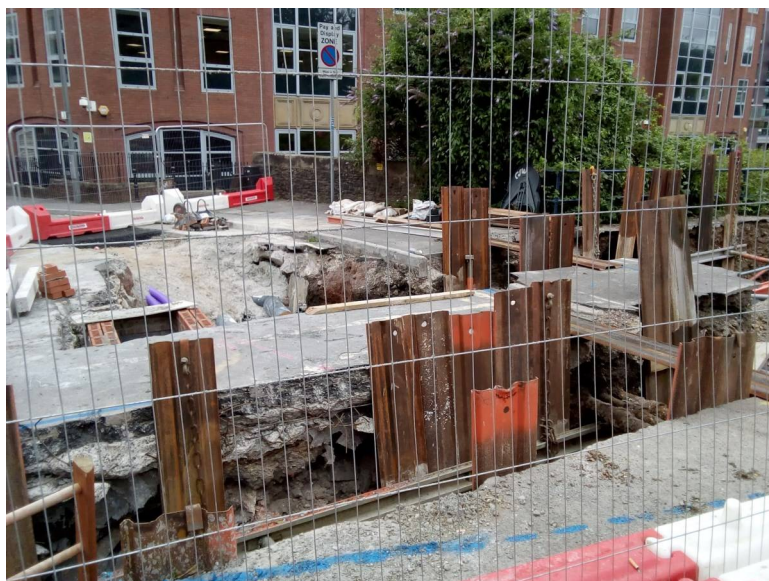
Location of probable 17th century wall, looking south-west towards castle moat
